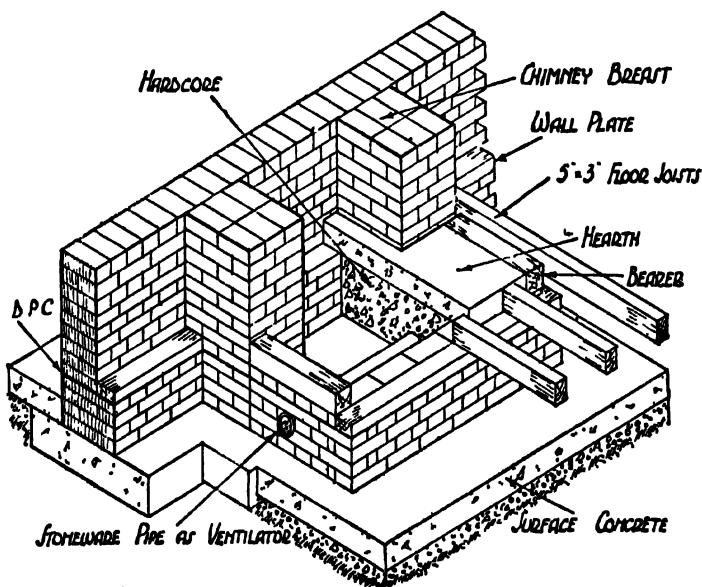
FENDER WALL AROUND FIREPLACE OPENING
